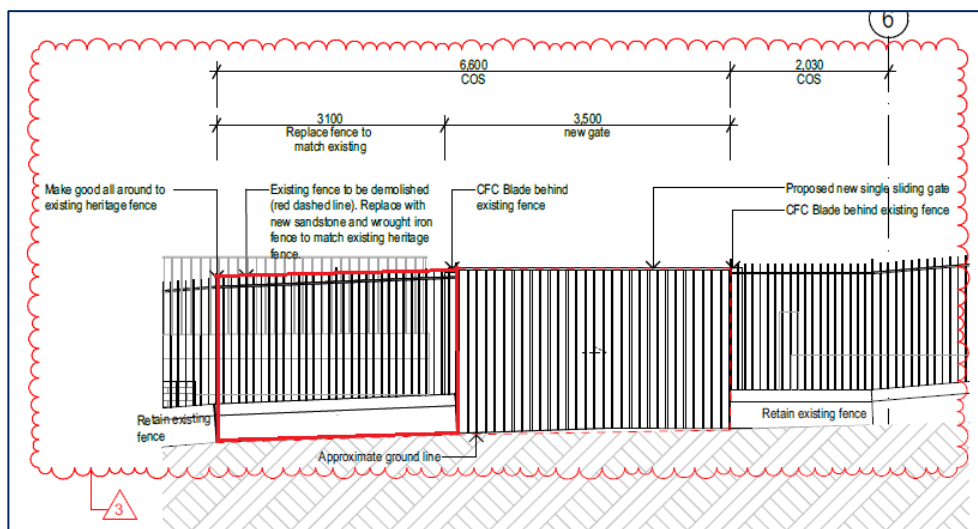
| Proposed modification to existing heritage fence facing Bay Road
